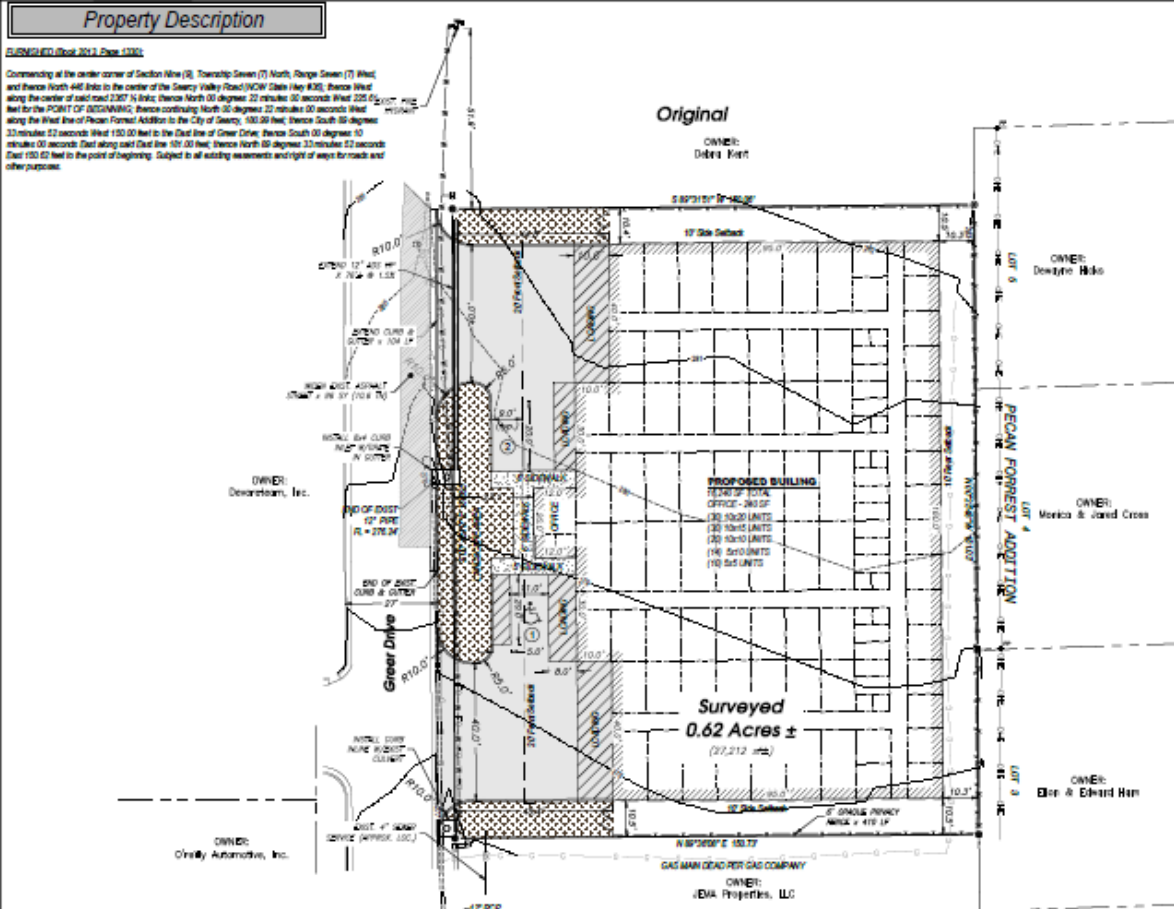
EXHIBIT B (ZONING DEVELOPMENT PLAN):
